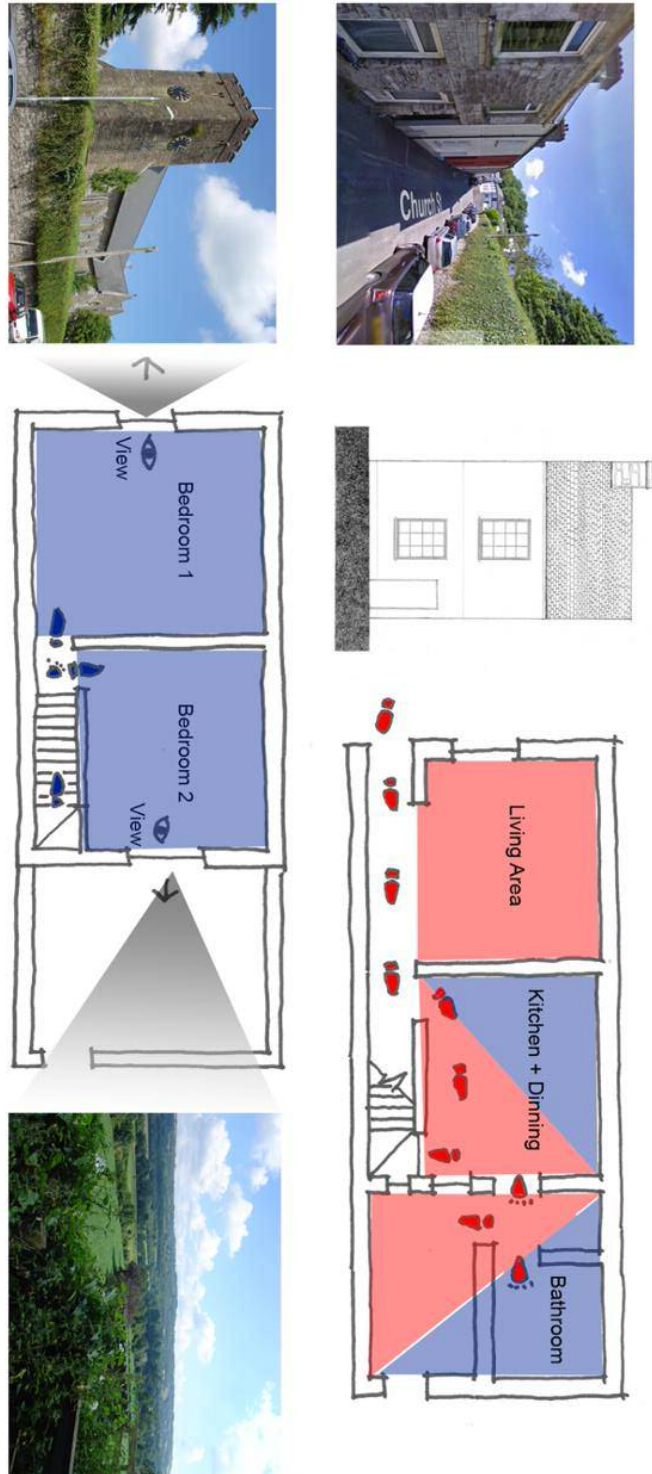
Building as found: the distribution of rooms with functions, views, streets image
